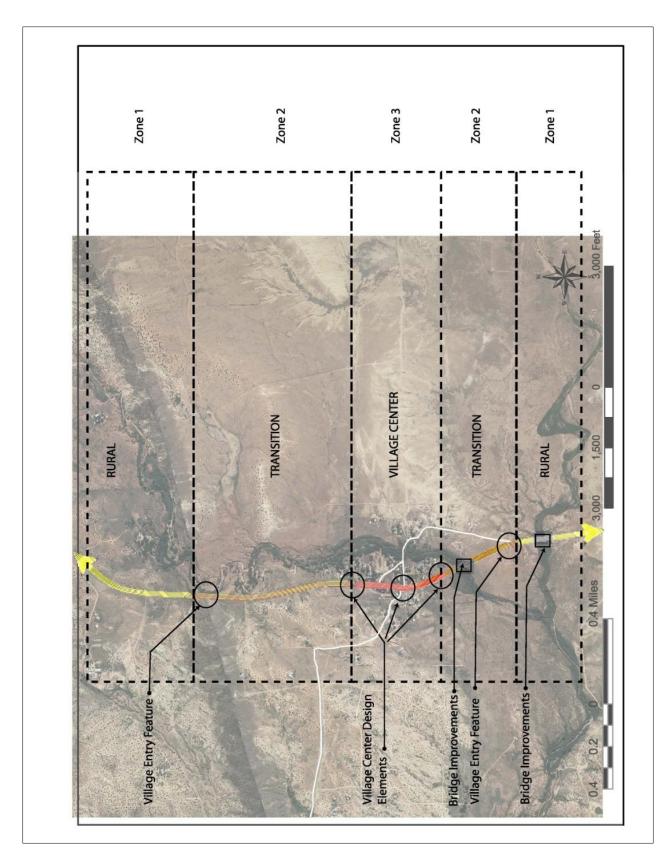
NM 41 ROAD CONCEPT PLAN
